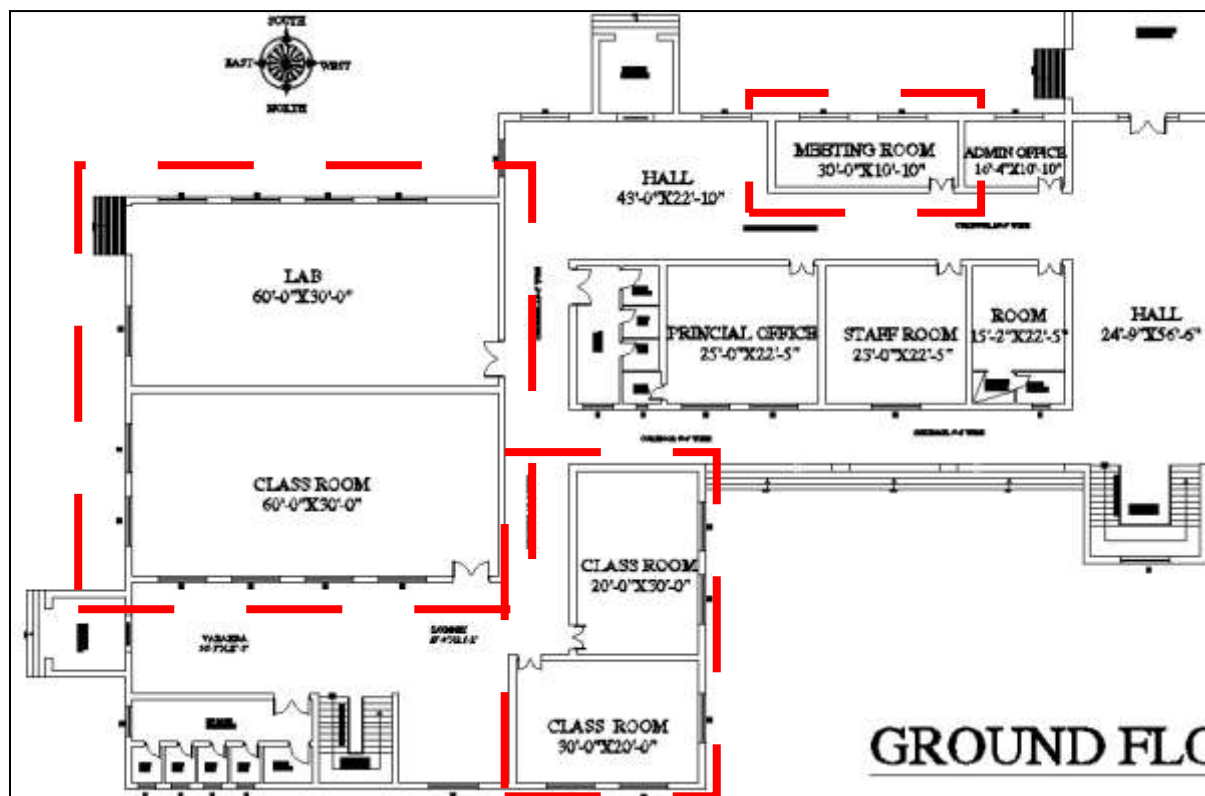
Ground Floor East Wing Plan of the Government College of Technology
